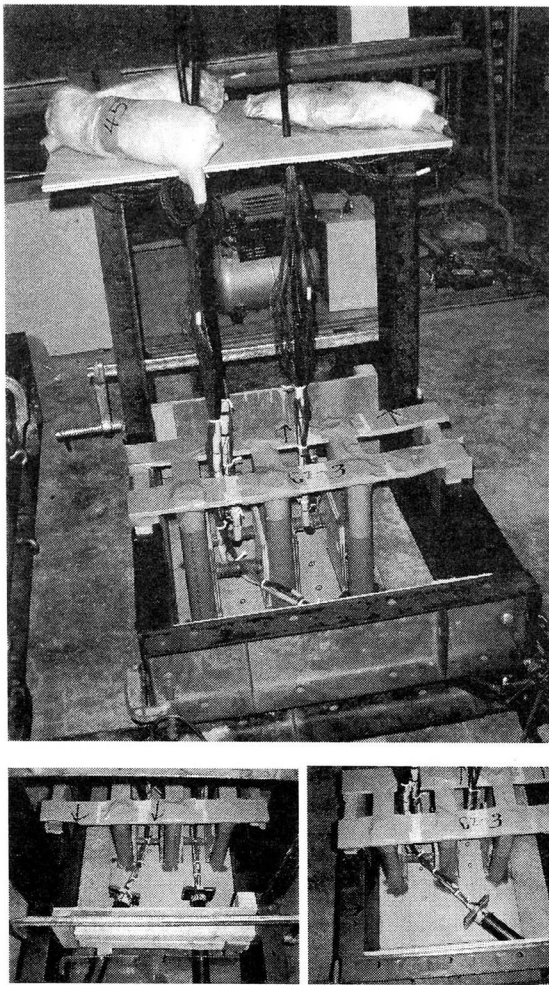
Combining three sets of Specimens C2-3 in one mold (up). Top view of all three bent specimens and end clamps (bottom).
